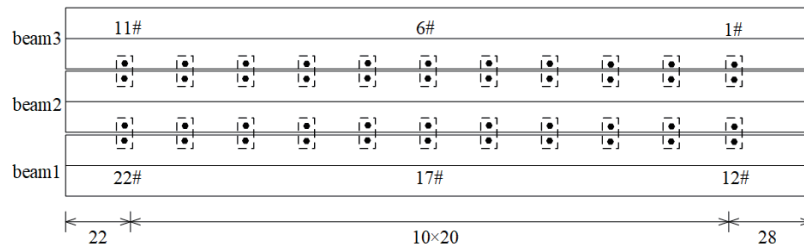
Transverse connection layout of the full bridge model (unit: cm).
